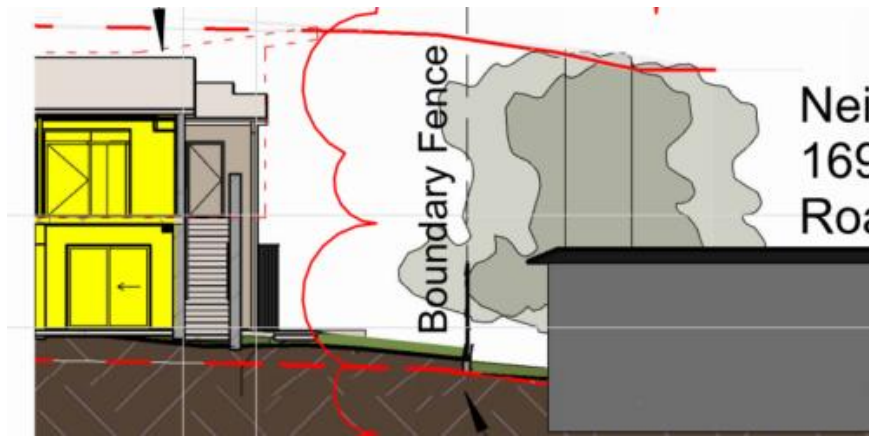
Proposed Boundary Section 9 - Showing Retaining Wall
